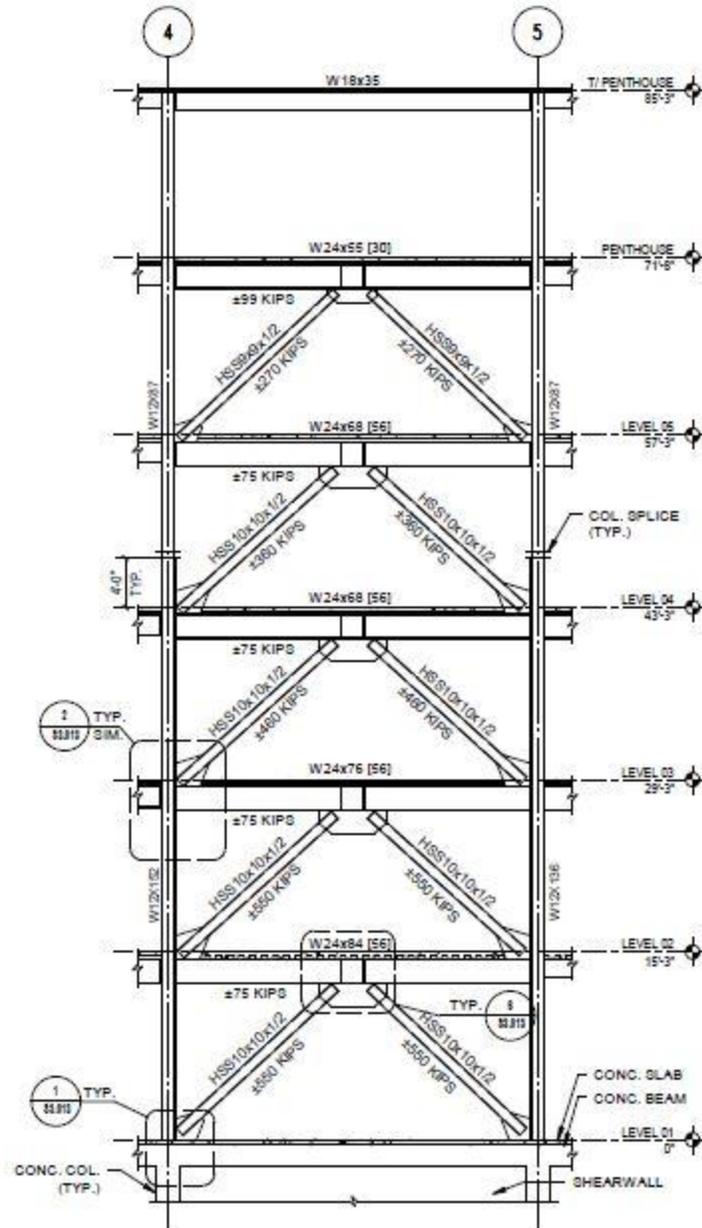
Typical Braced Frame Elevation with Penthouse Support Included (Construction Documents)
